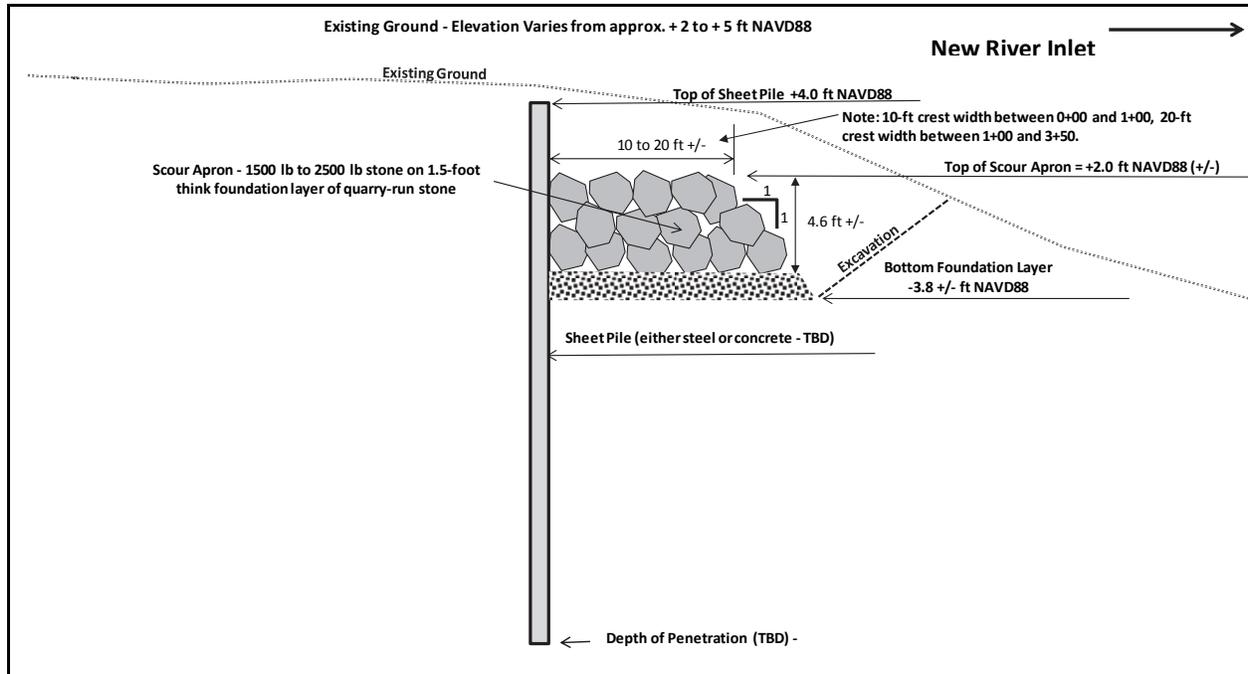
Typical terminal groin Cross-Section C-C-shore anchorage section-centerline stations 0+00 to 3+50.
